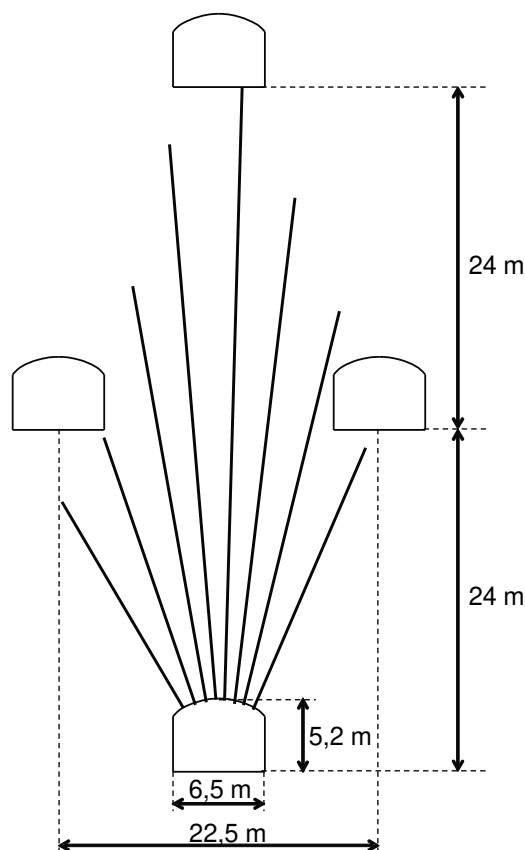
Schematic layout of a drilled ring (Manzoor et al. 2022b)
